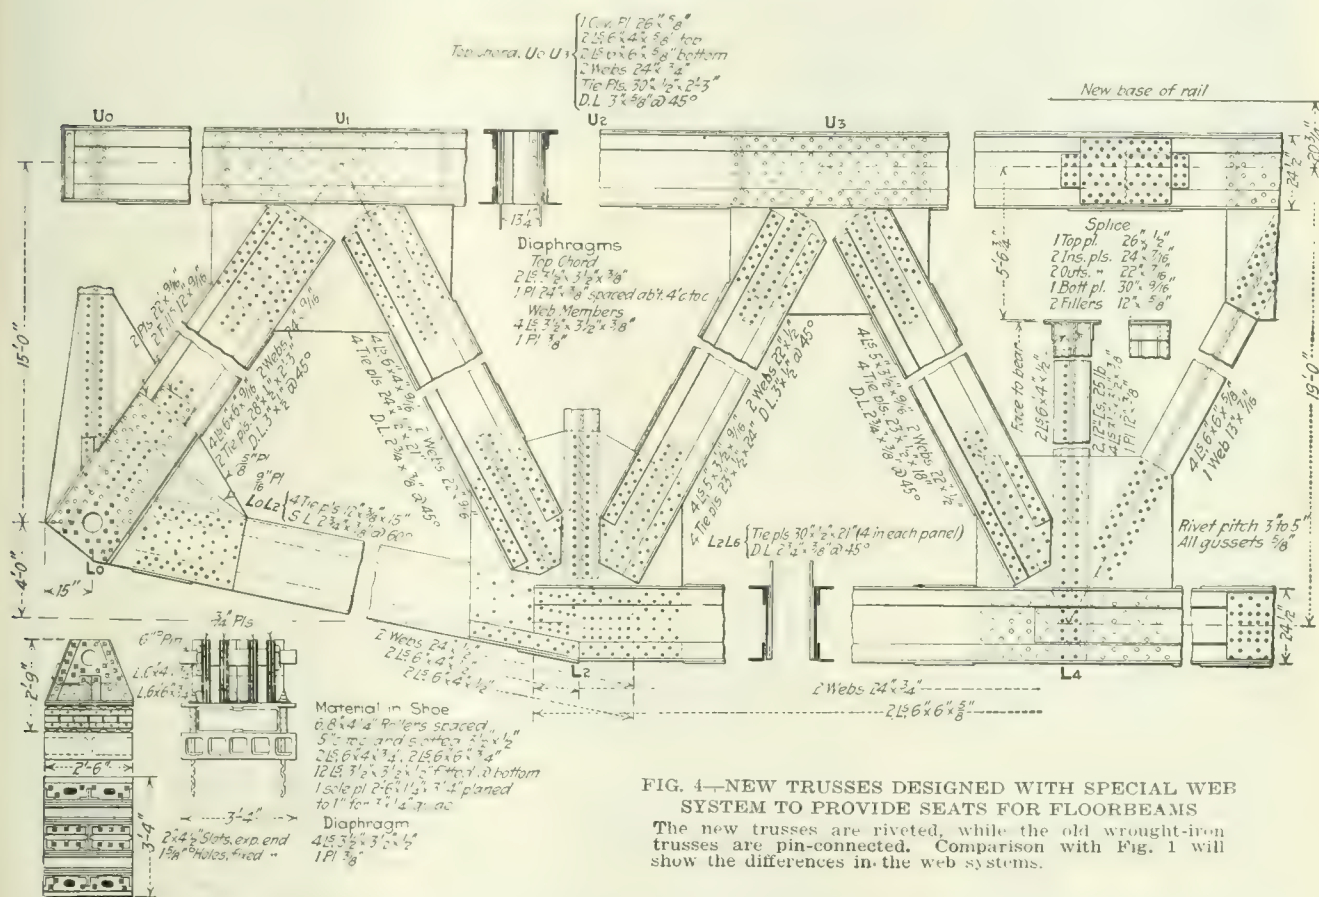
NEW TRUSSES DESIGNED WITH SPECIAL WEB SYSTEM TO PROVIDE SEATS FOR FLOORBEAMS
